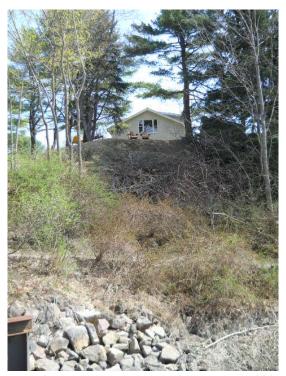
Proposed pipe run to outfall southwest of 81 Winding Way (proposed outfall just right of existing rip rap)
